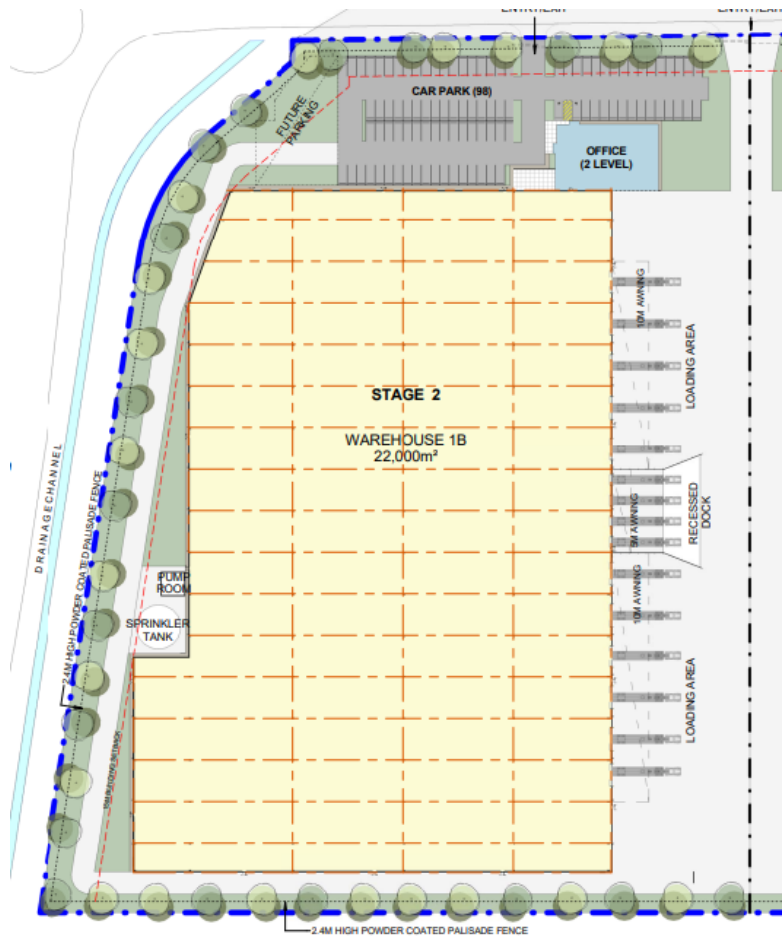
| Stage 2 Warehouse Site Plan, Original Consent
